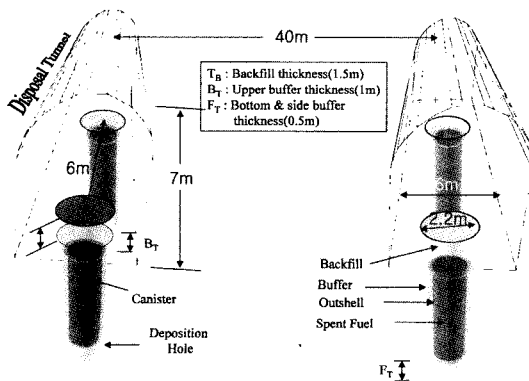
Preliminary layout of PWR disposal tunnel and deposition hole
